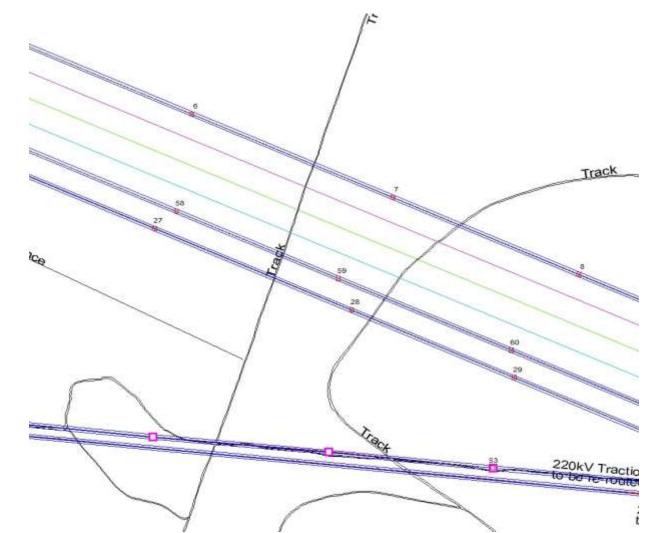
Development plan indicating the proposed construction sites and relevant access tracks that must be used.
